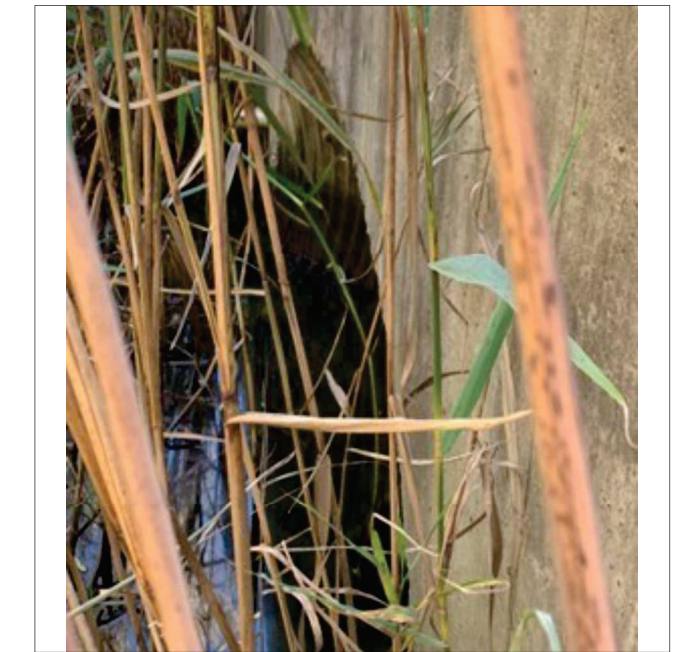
At Watercourse Crossing 3, a large culvert and concrete headwall conveys stream from forested ravine north of CR 46.
